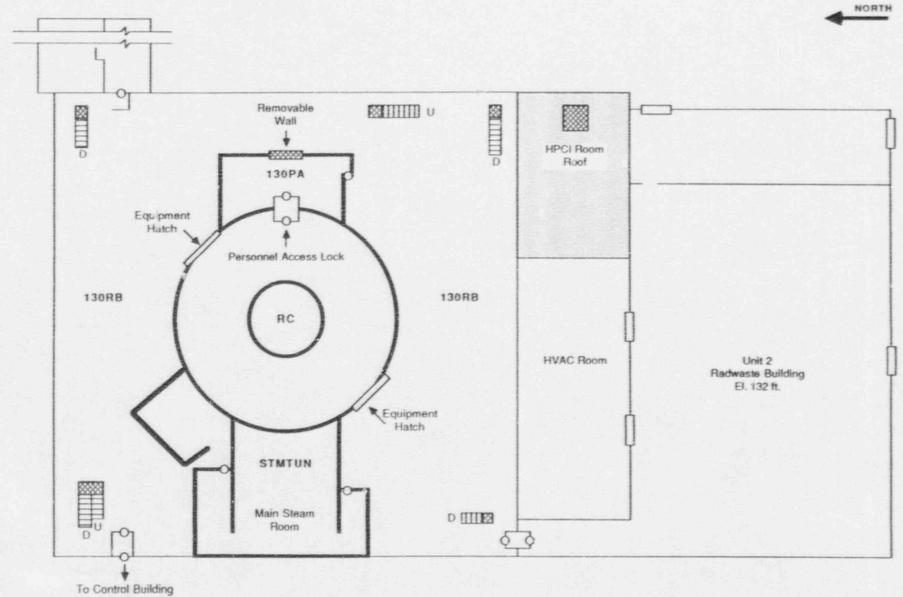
Hatch Unit 2 Reactor Building Arrangement - Elevation 130 ft.
